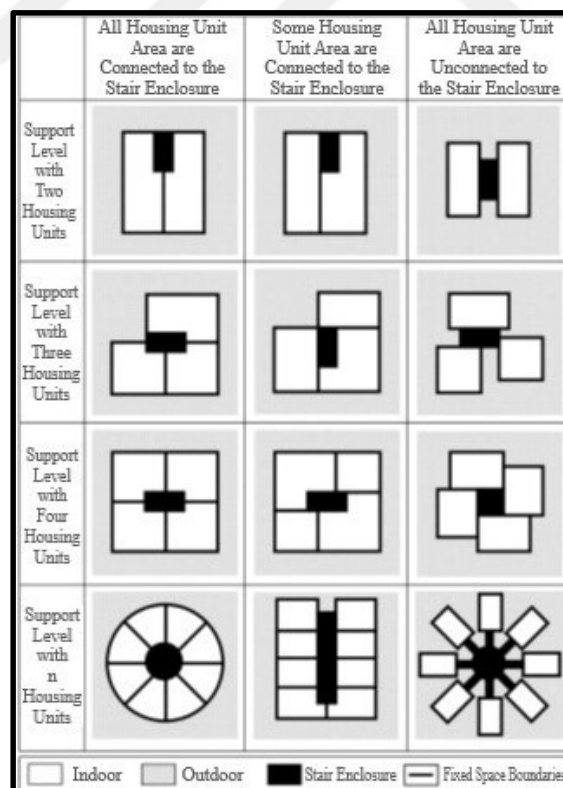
Support structure plan types, grouped by the association between housing units - stairway house in multi-storey flexible housing design, translated into English by author
